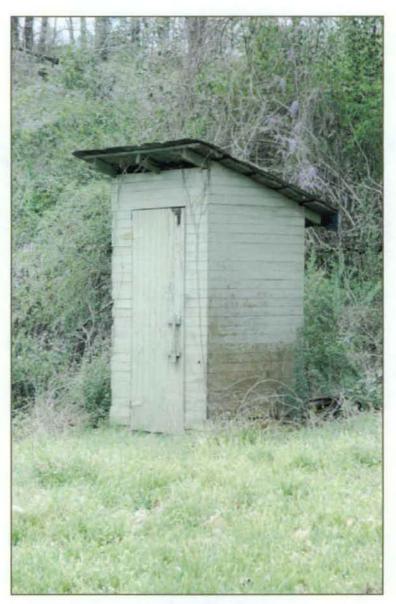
Privy, View #1, East (Left) and North (Right) Elevations, Camera Facing Southwest.
